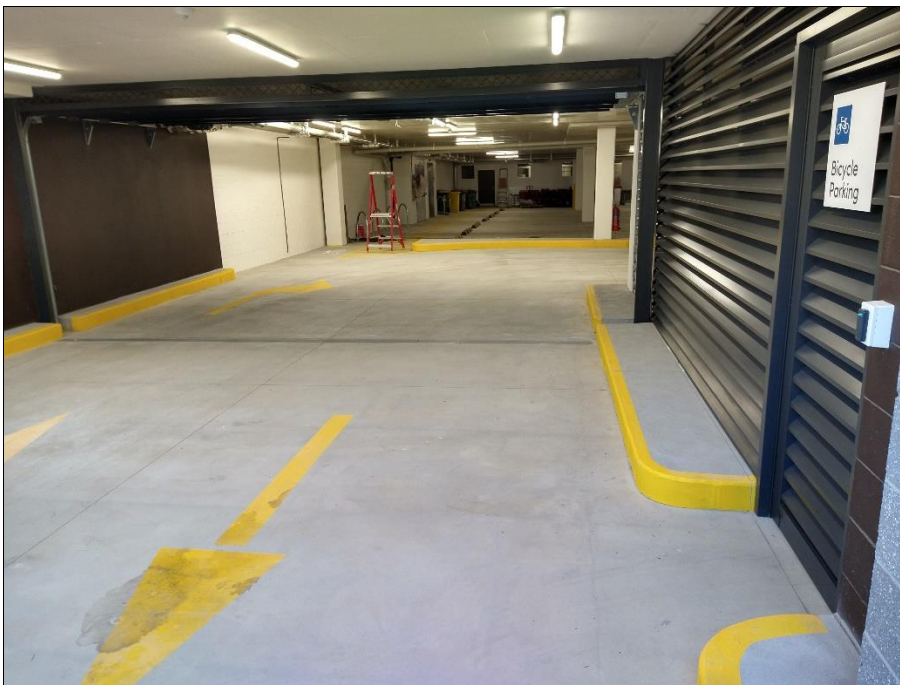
Looking south at concrete pavements within the underground carpark of the Education Building (20 August 2021)
